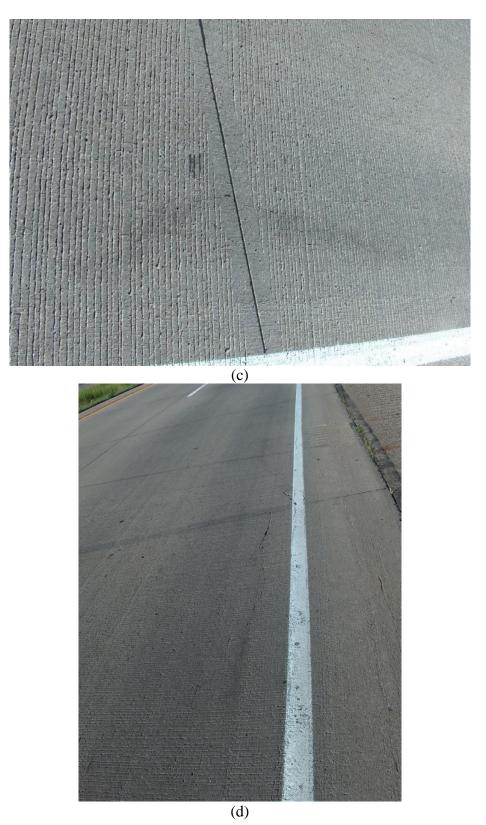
Pavement at LC Site 6 – US 65 in Polk County
